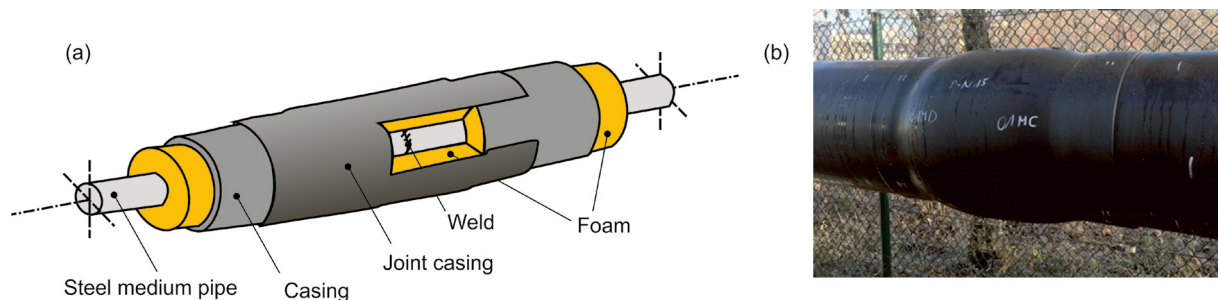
District heating joint system, (a) technical scheme, (b) Foto
